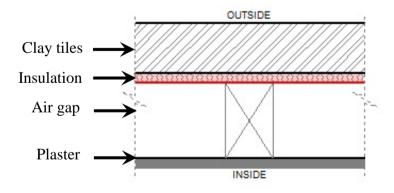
Arrangement of layers in insulated clay-tiled roof
